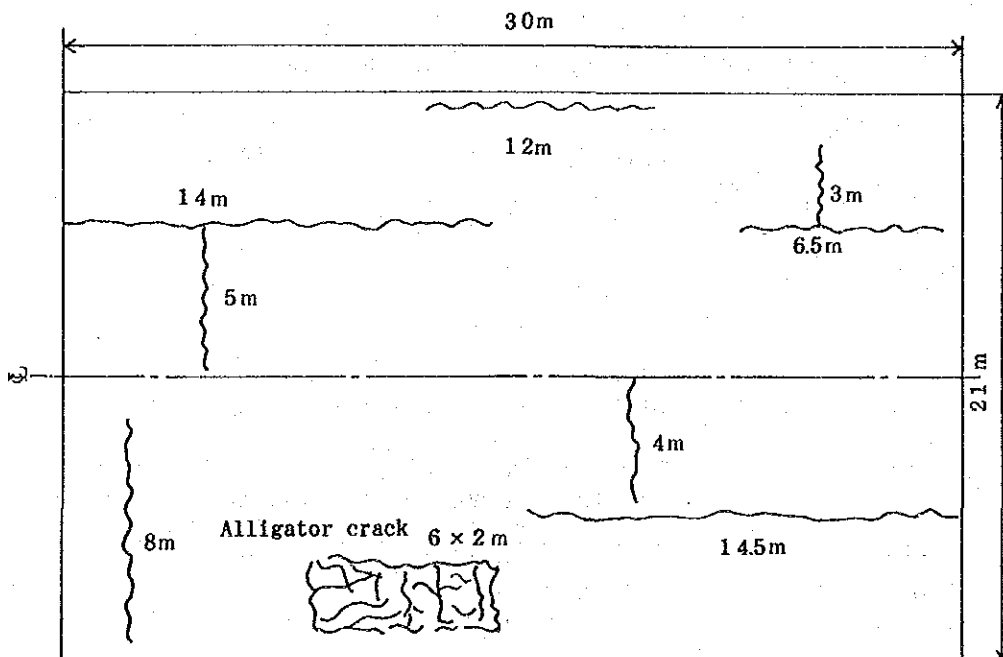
Example of Crack Inspection for Flexible Pavement
